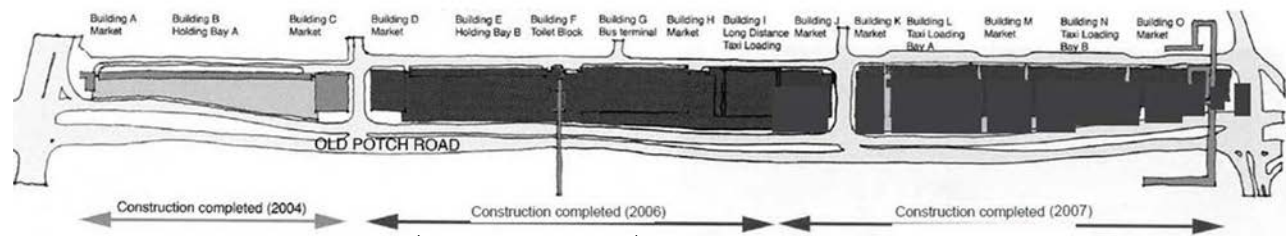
Baragwanath Transport site plan (Adopted by Author 2018)
